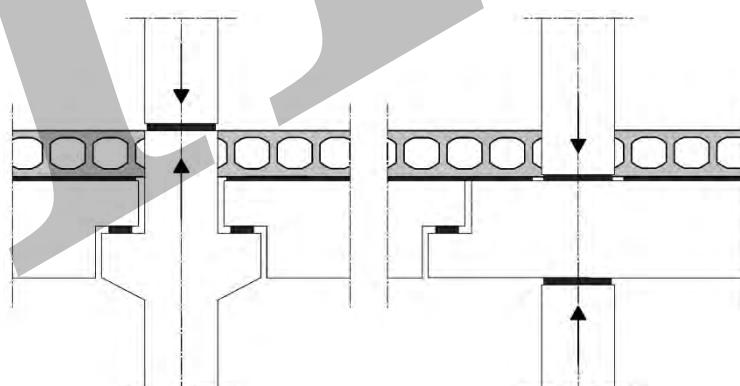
Two alternative solutions for column-beam detailing in precast concrete. Solution A will perform better for load transfer than solution B.
